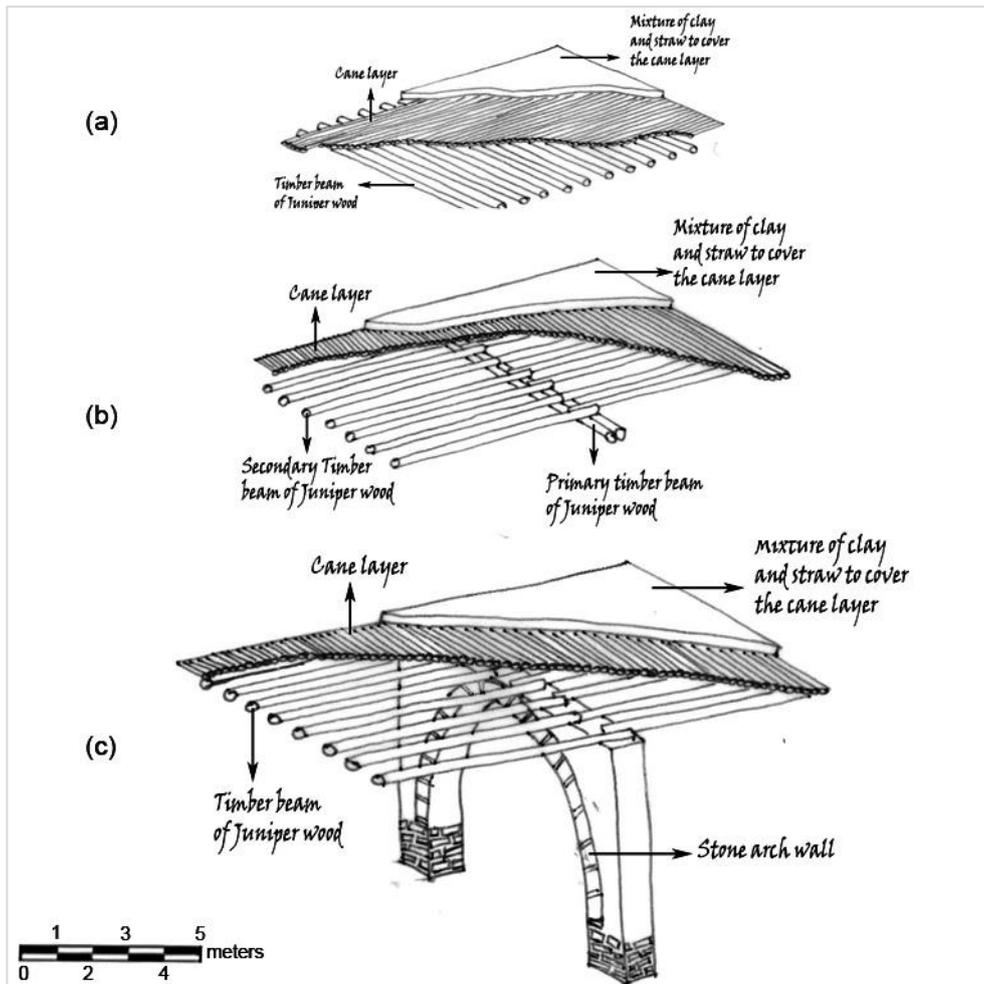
Types of roofing methods: (a) the simplest method of just one-way timber beams; (b) for bigger buildings, single or double primary timber beams were added; and (c) the developed method with the incorporation of one to a maximum of three arches (Author 2019)
